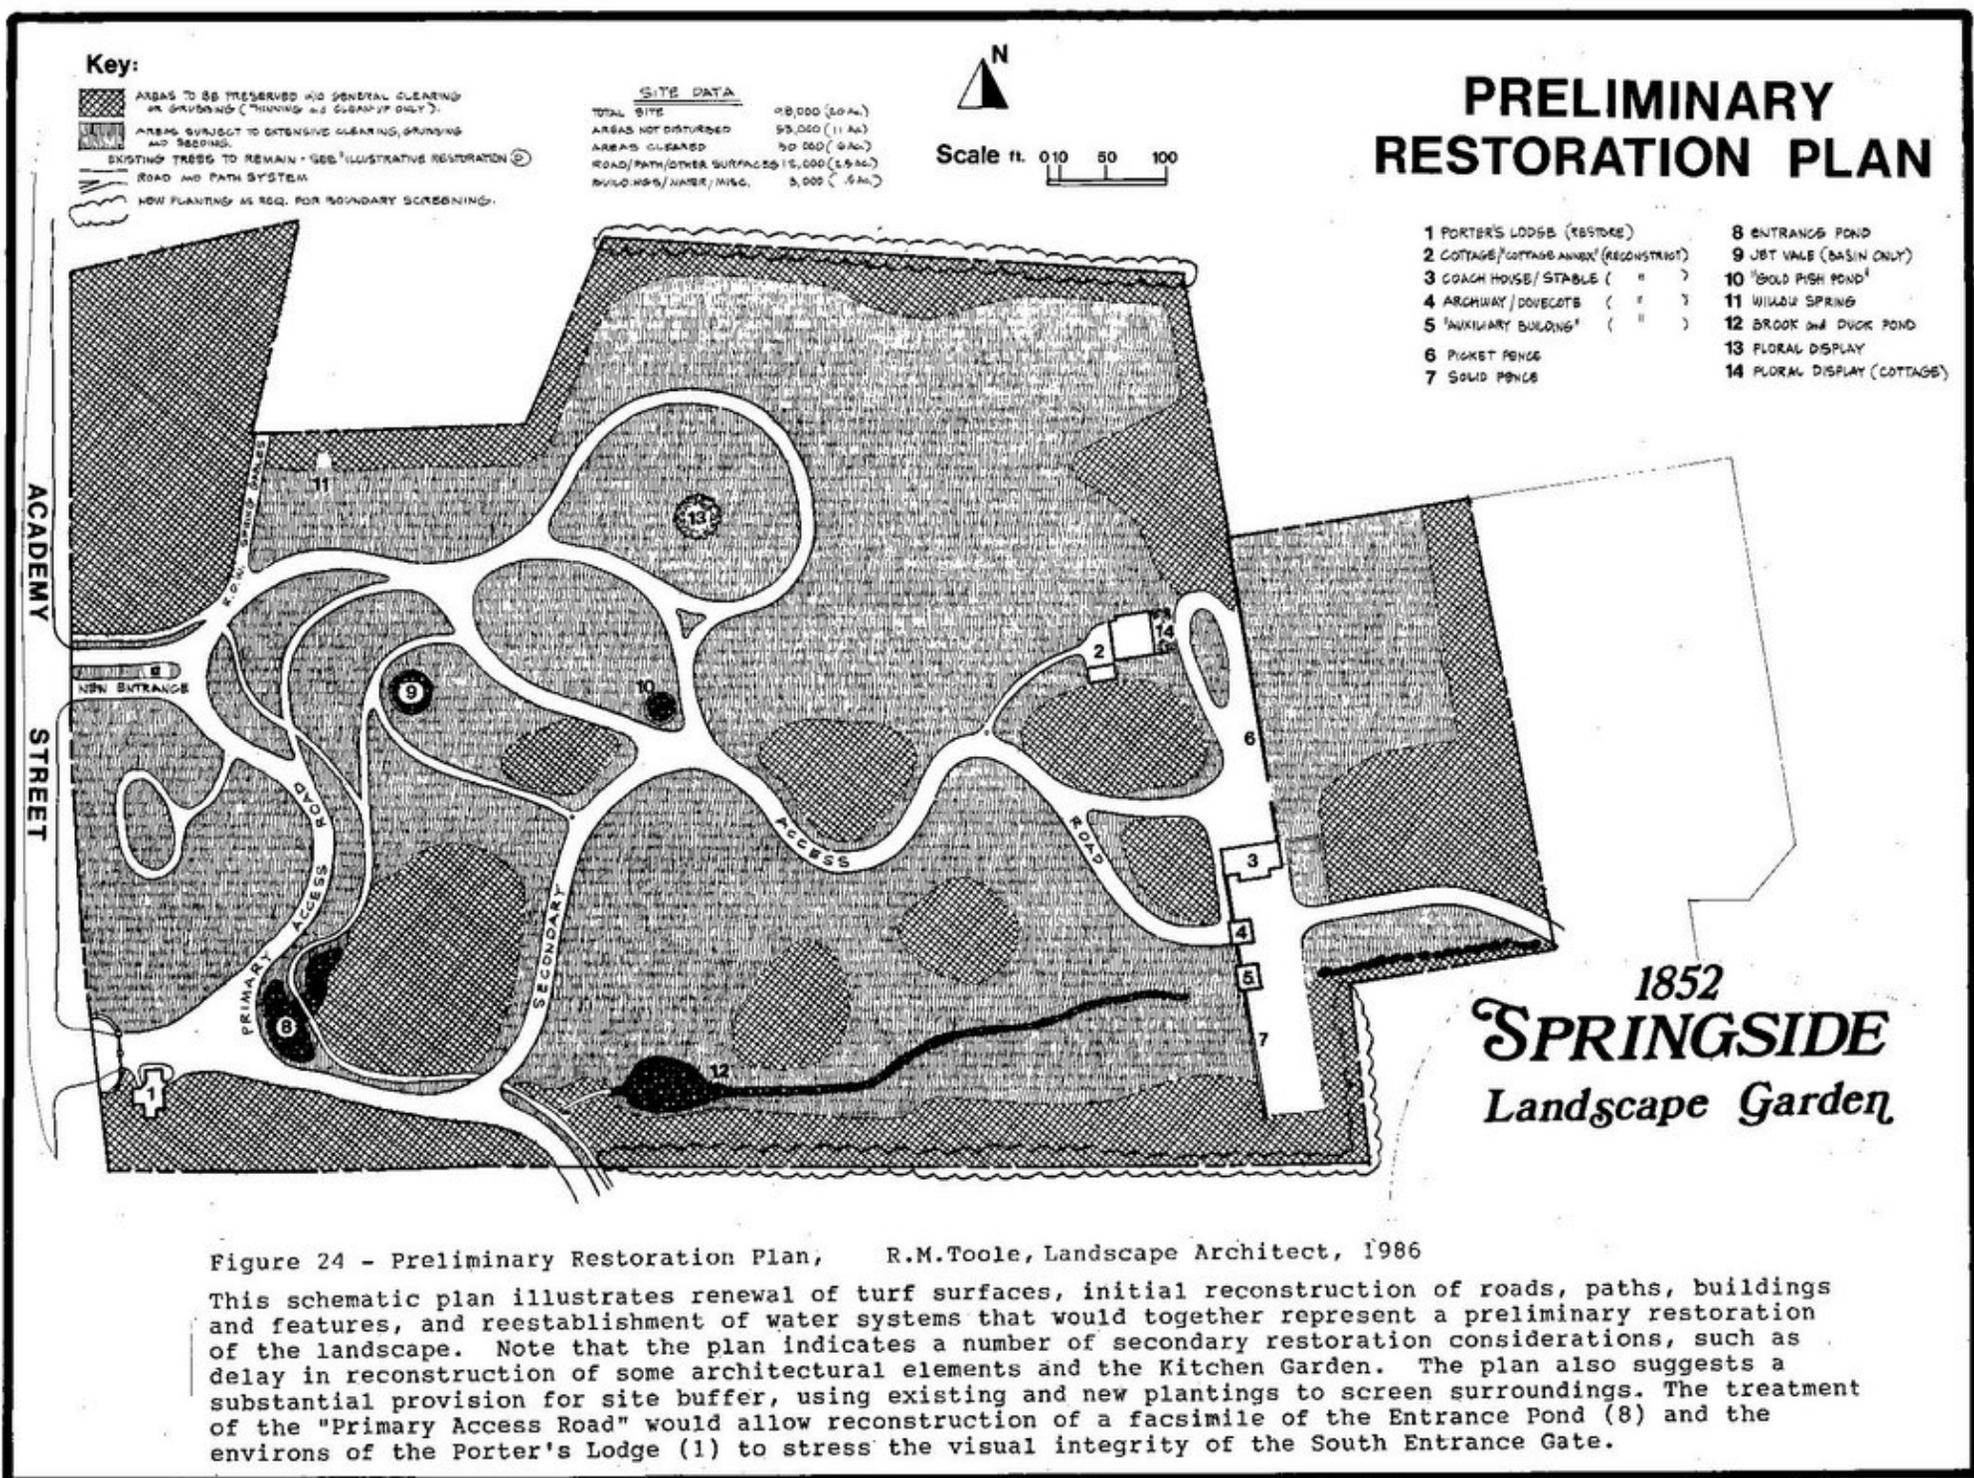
Preliminary Restoration Plan, R.M.Toole, Landscape Architect, 1986
